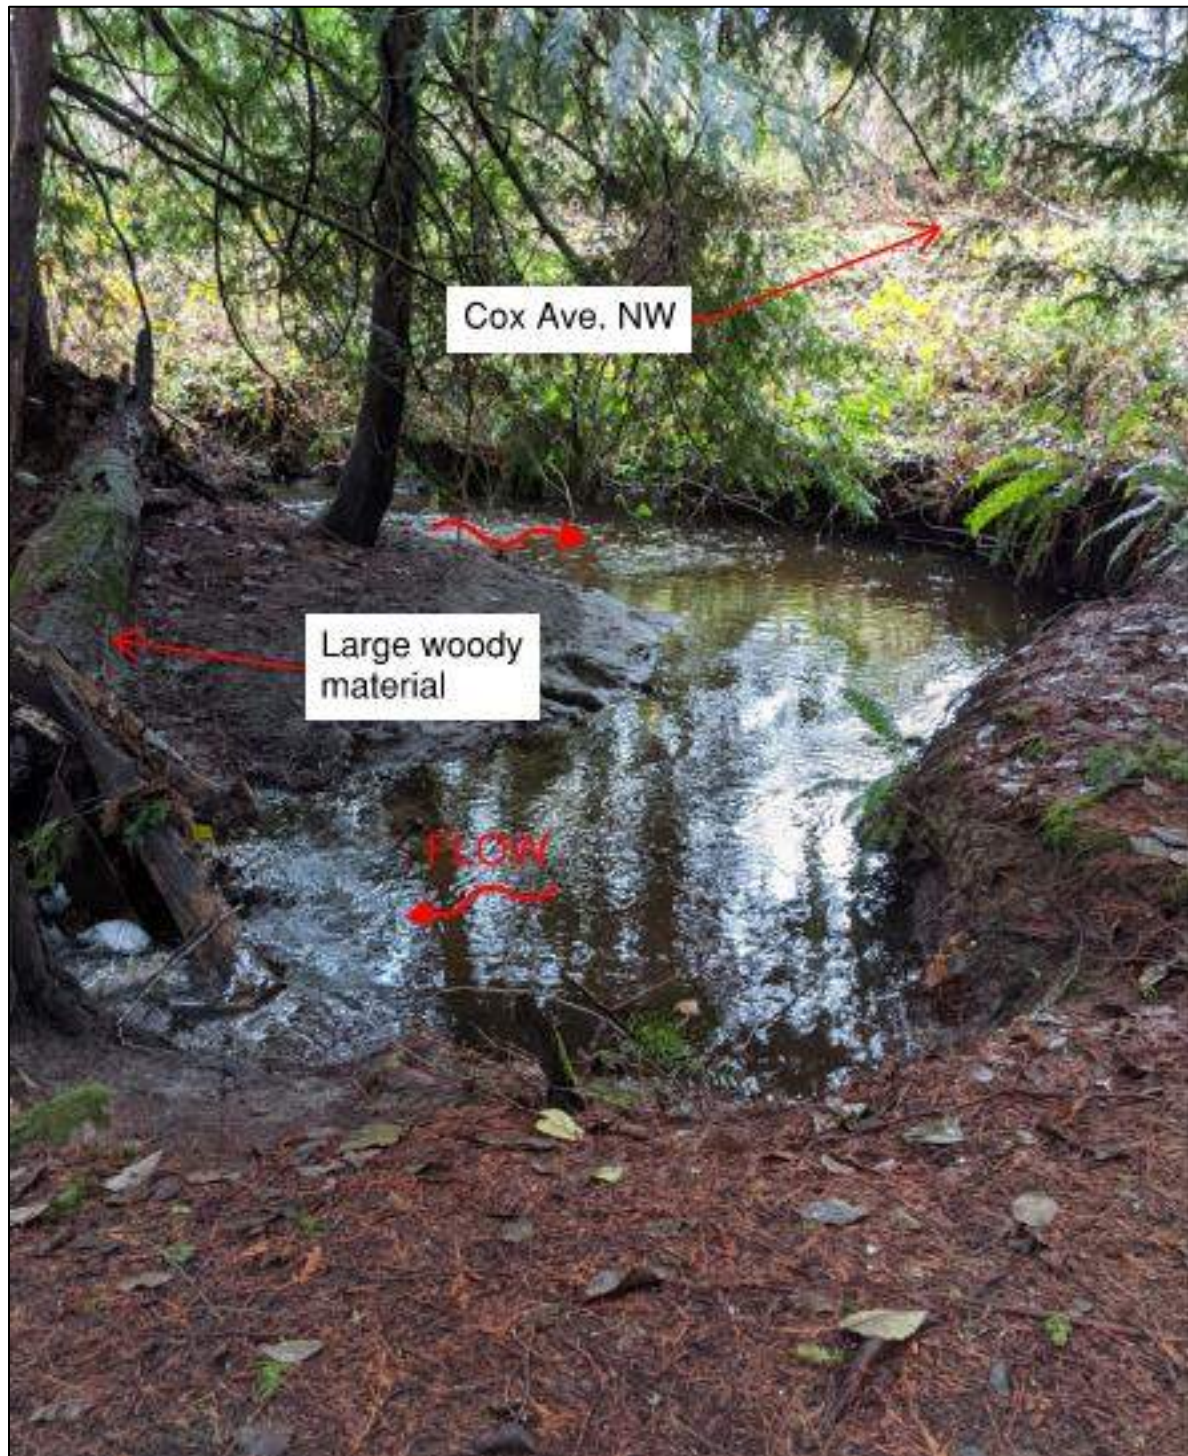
Wier downstream of culvert scour hole (STA 3+30)
